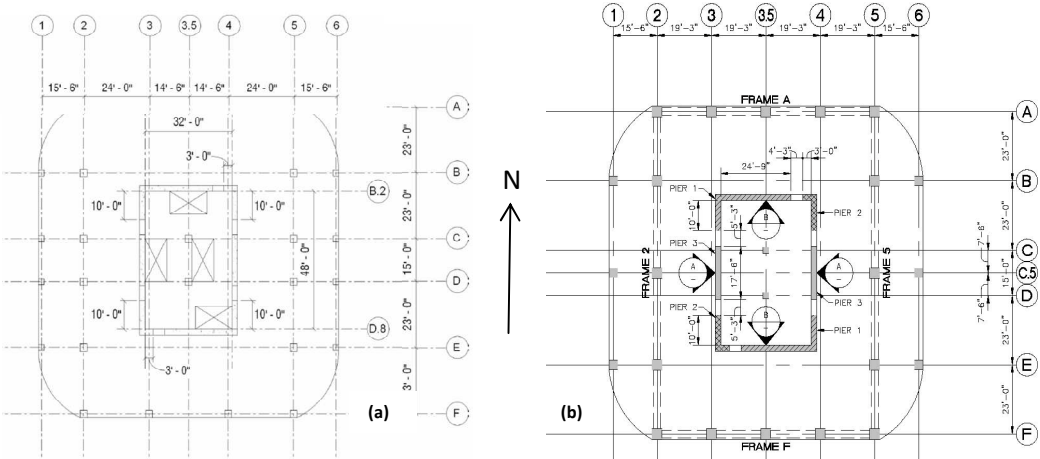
Plan view of the buildings, (a) Building 1, (b) Building 2
